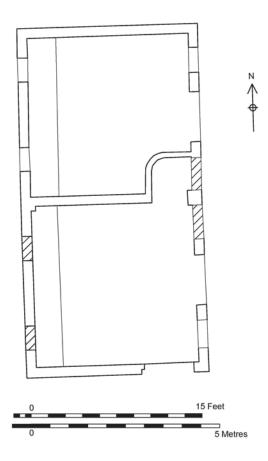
Floor plan of Building B (derived from plan supplied by client).
